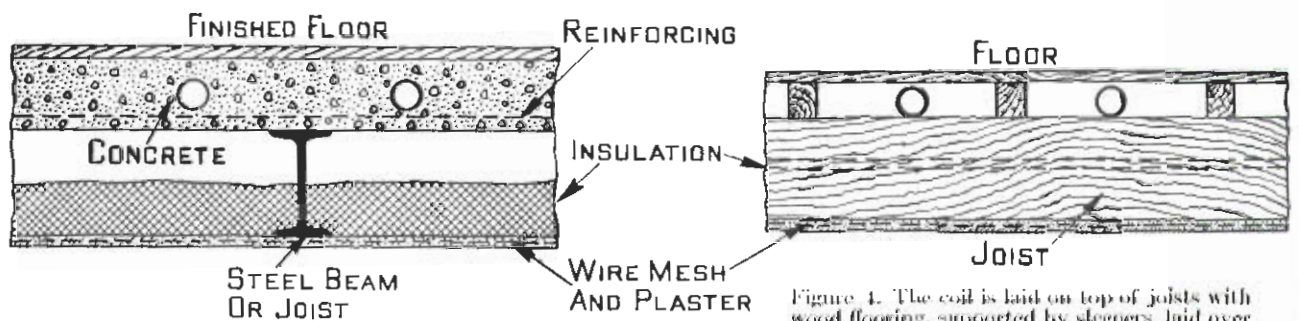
Radiant heating coil is shown embedded in concrete floor panel over reinforcing supported by steel beam or joist.
